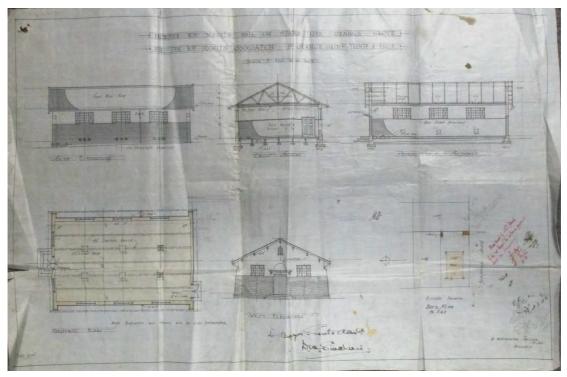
Proposed new Scouts Hall on Stand 1145 in Orange Grove from 1925 (Source: City Council of Johannesburg, Plans Archive)
